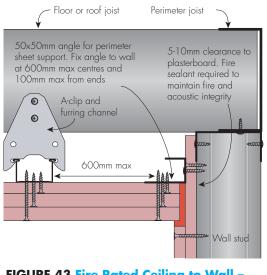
Fire Rated Ceiling to Wall – Alternate Detail
